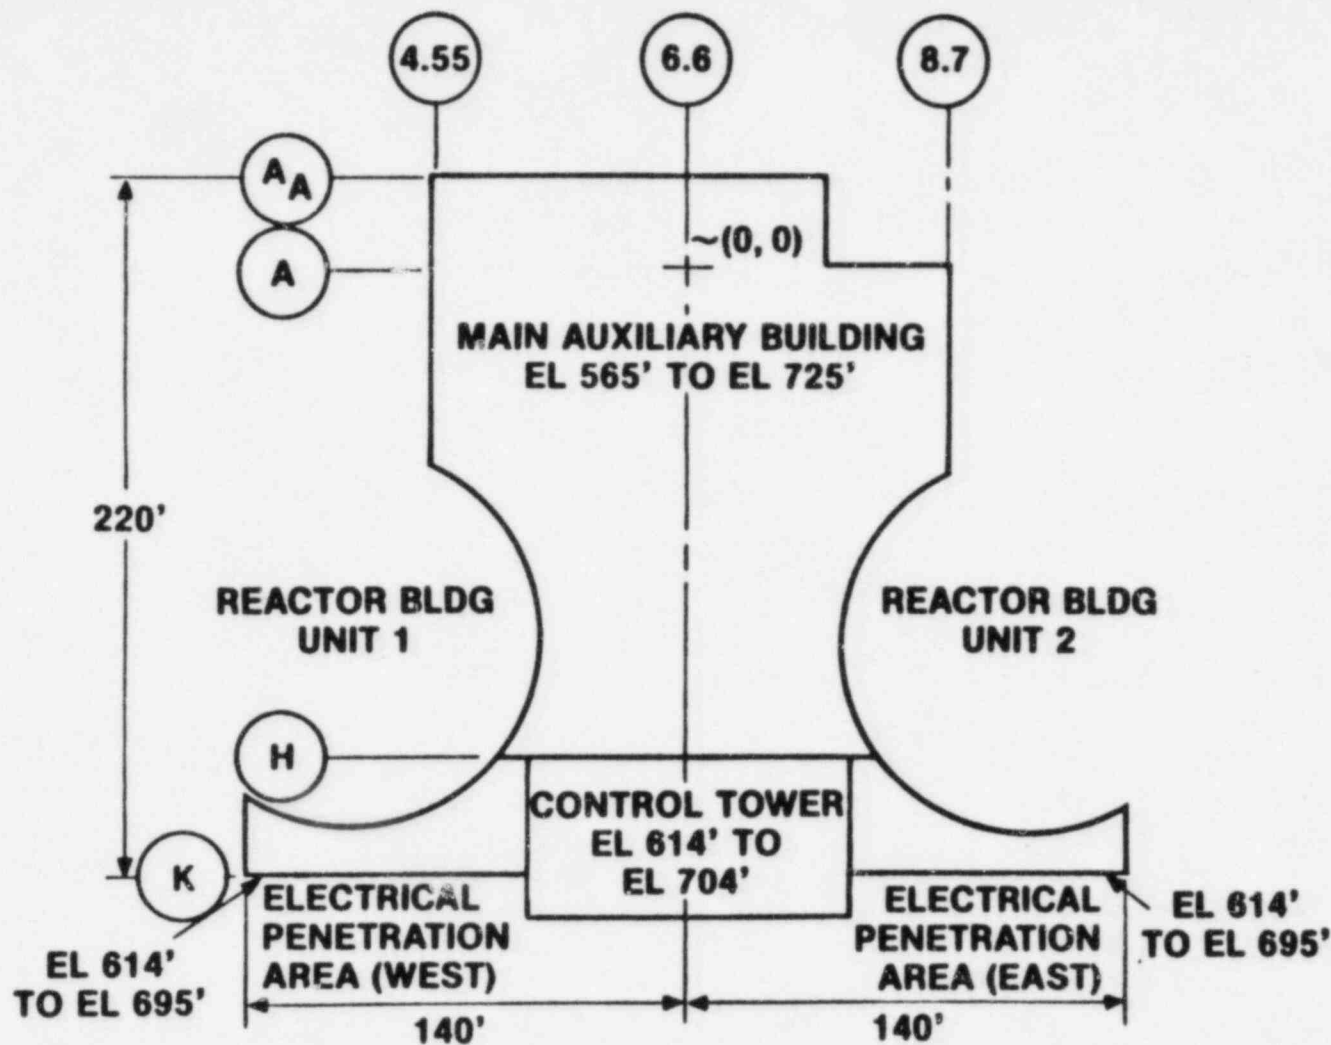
SCHEMATIC PLAN VIEW OF AUXILIARY BUILDING, CONTROL TOWER AND ELECTRICAL PENETRATION AREAS
